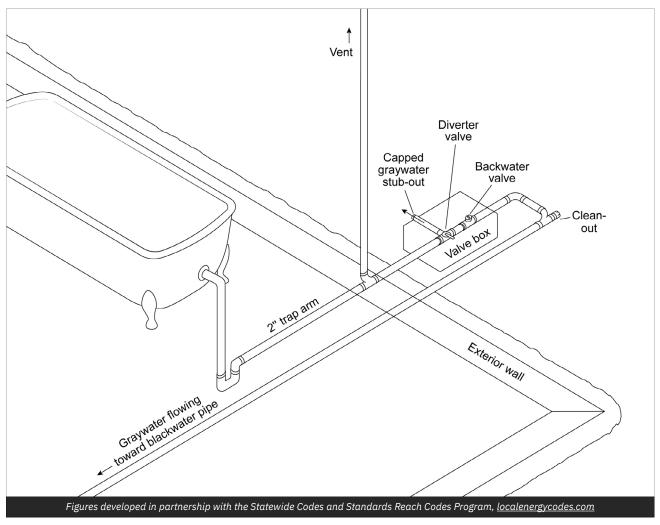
Dual Drainage Plumbing: Graywater drain extends outside slab for access, then returns into slab to join other drainage plumbing
